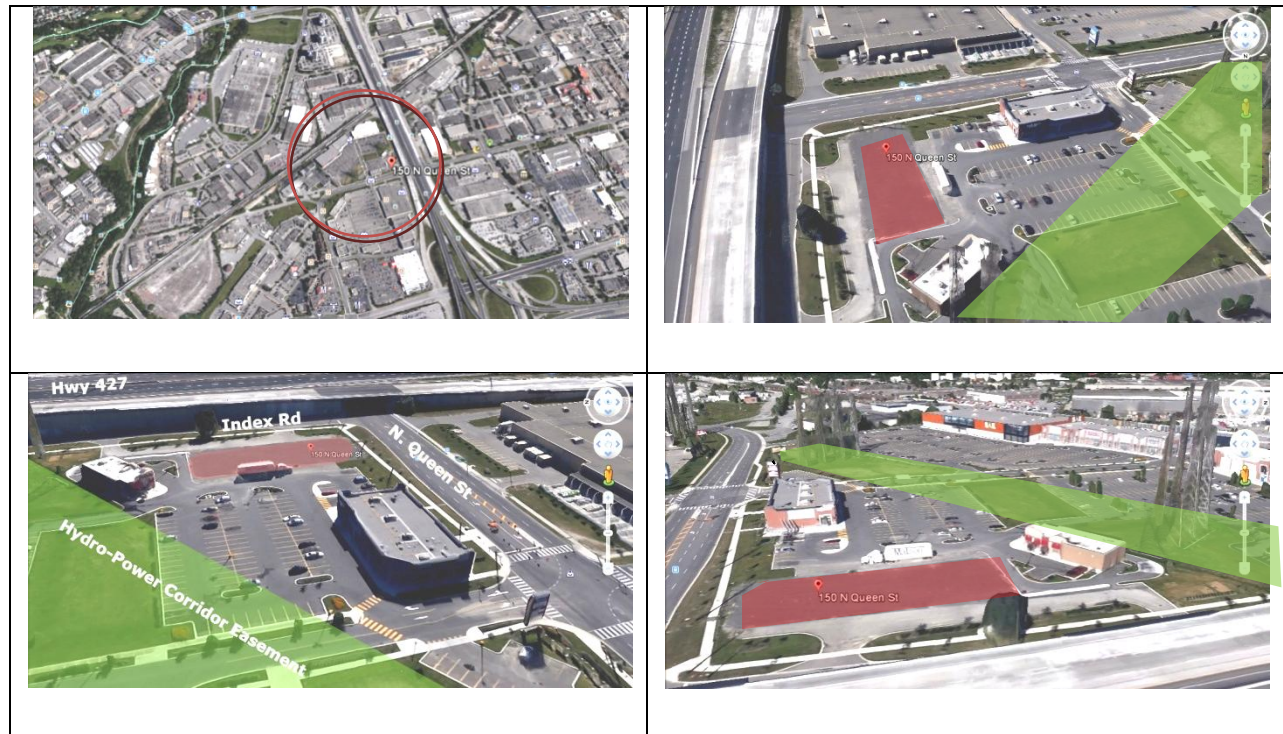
Areal views of baseline building site in Toronto before start of construction
